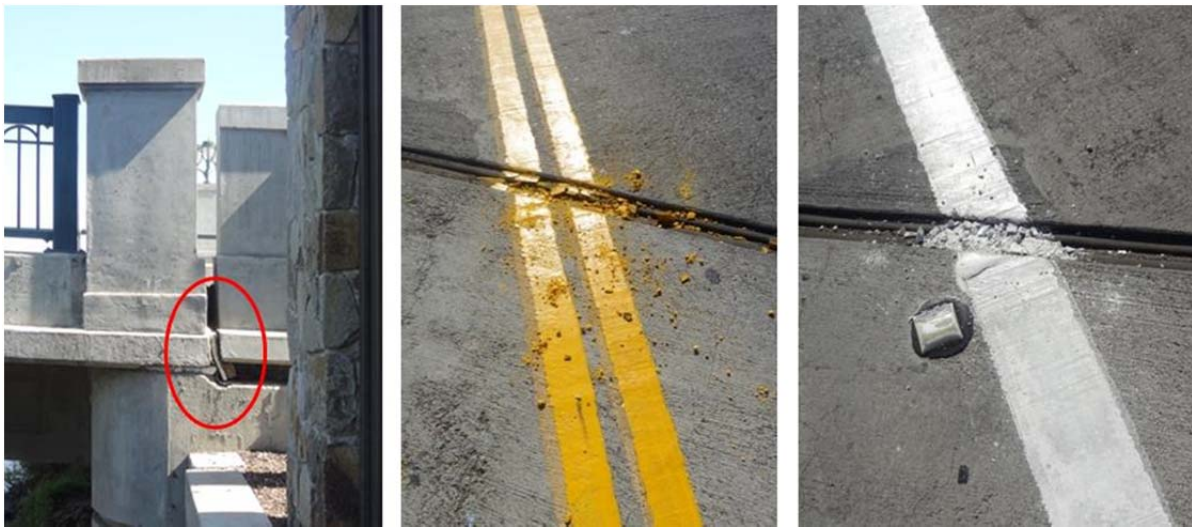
Deformation at First Street Bridge expansion joint led to filler material damage.
